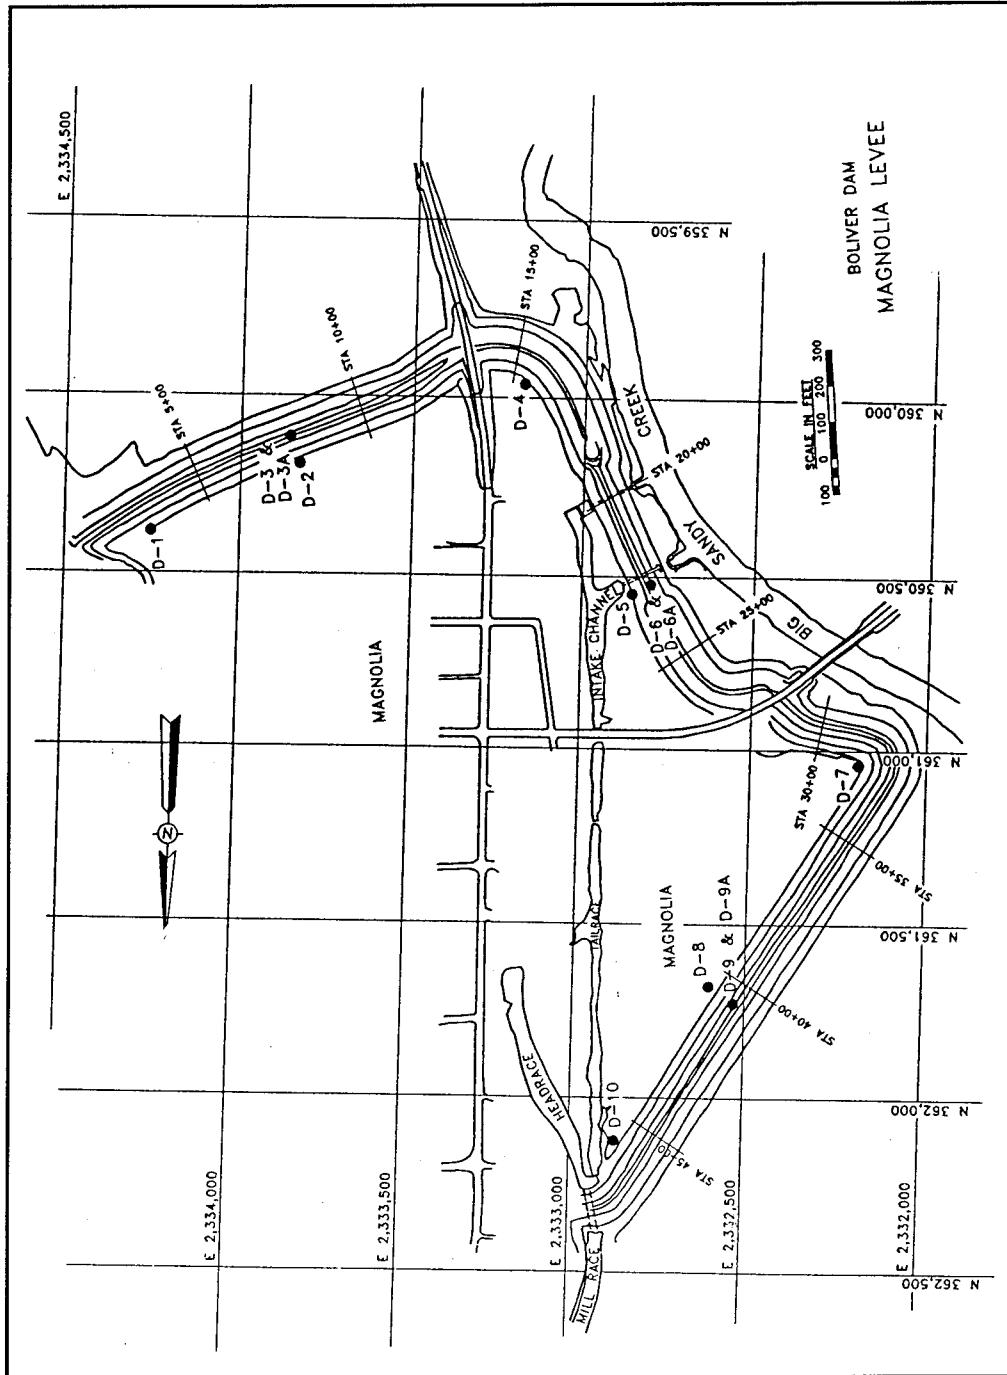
Piezometer location plan and site layout - Magnolia Levee
